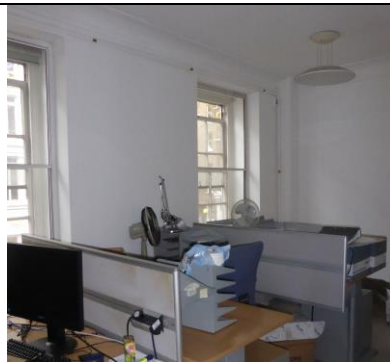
Existing First Floor Office F1 to Gray's Inn Road
